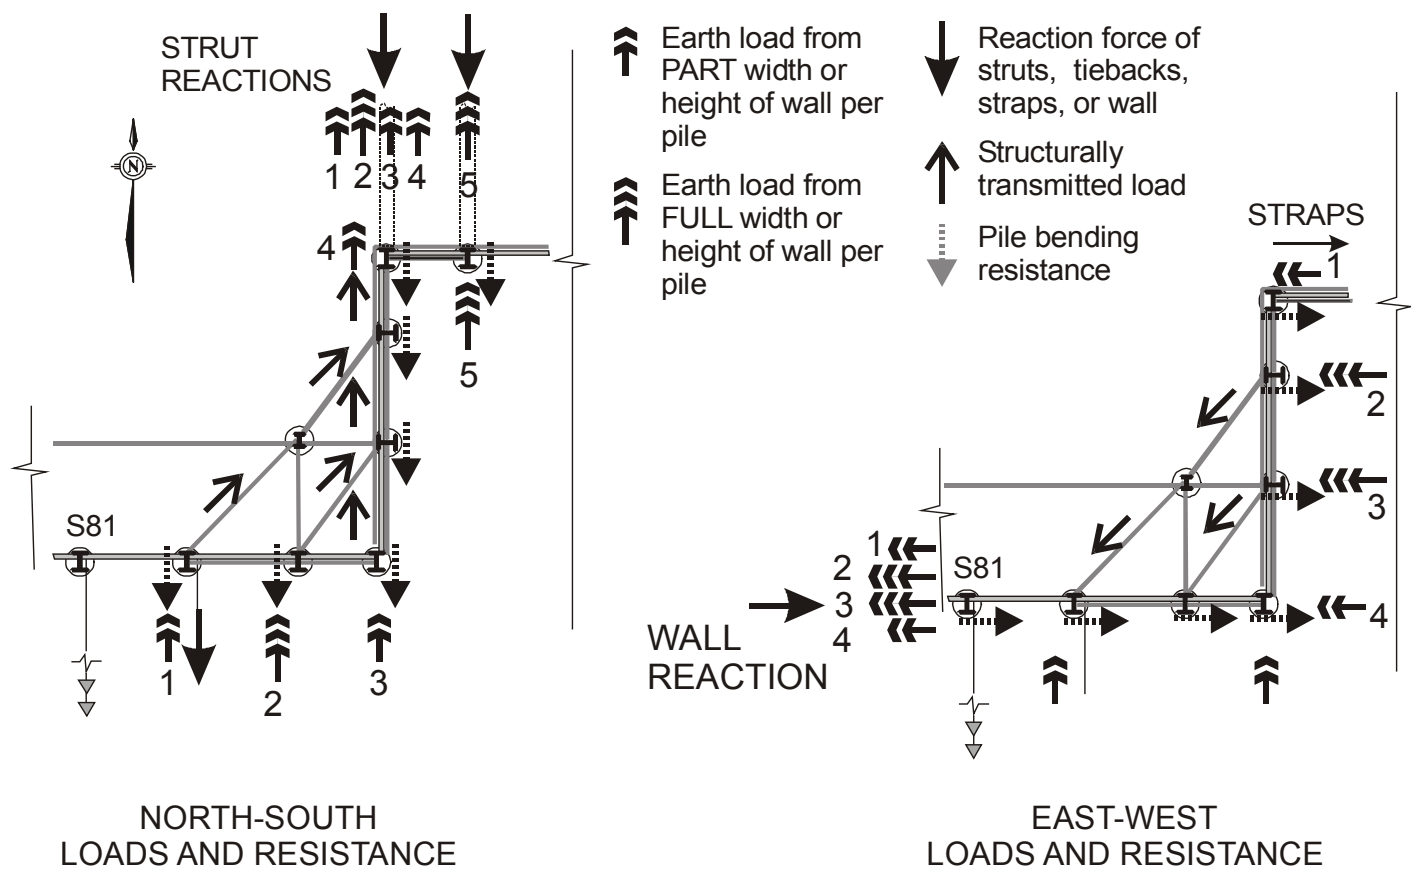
Earth loads and support mechanisms for shoring corner had all structural members been in place.
